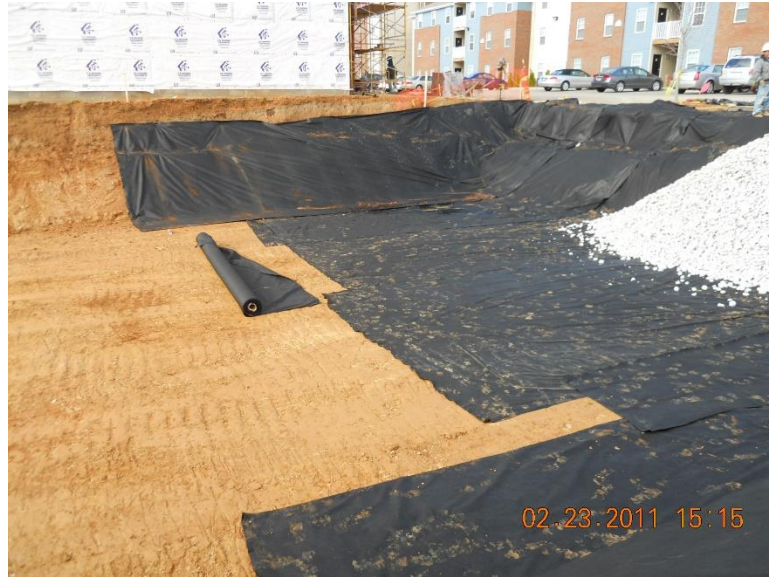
A non-woven geotextile is being placed on the bottom and the walls of the basin.
